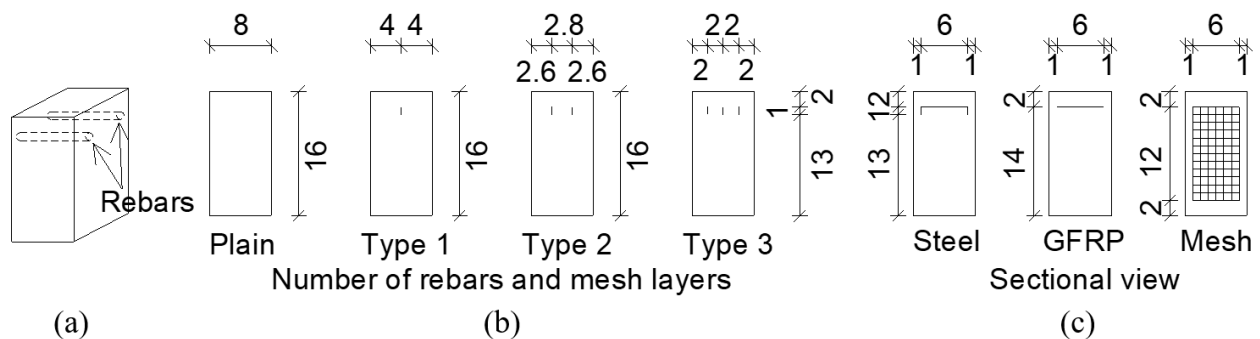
Various reinforcing schemes for anchorage zones (units in in.): (a) three-dimensional view; (b) placement of reinforcement; (c) sectional view
